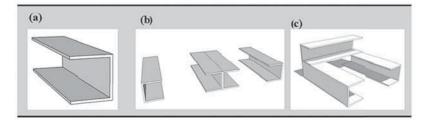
(a) Precast concrete C; (b) Juxtaposed structures; (c) House in Luanda (2010).
